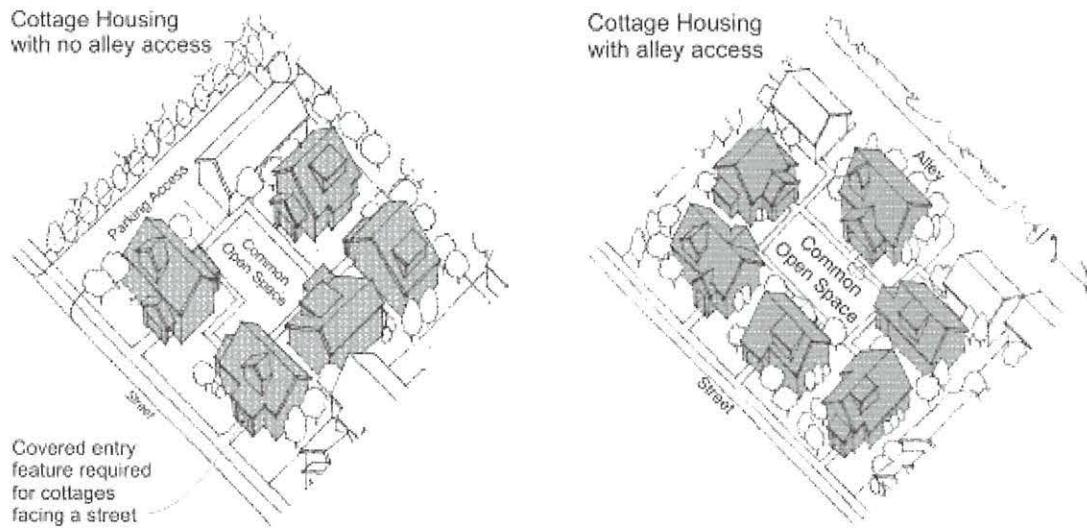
(M)(1). Typical cottage housing layouts.
